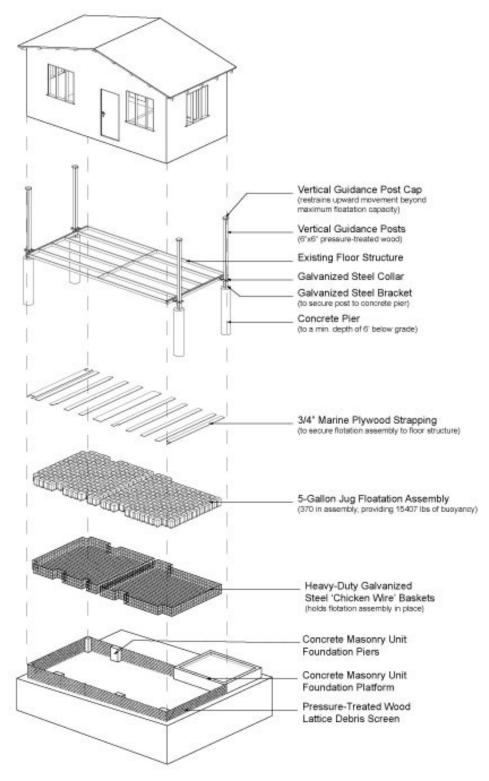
Buoyant foundation retrofit schematic-Bliss Pastures house (drawing by: Scott Turner)
